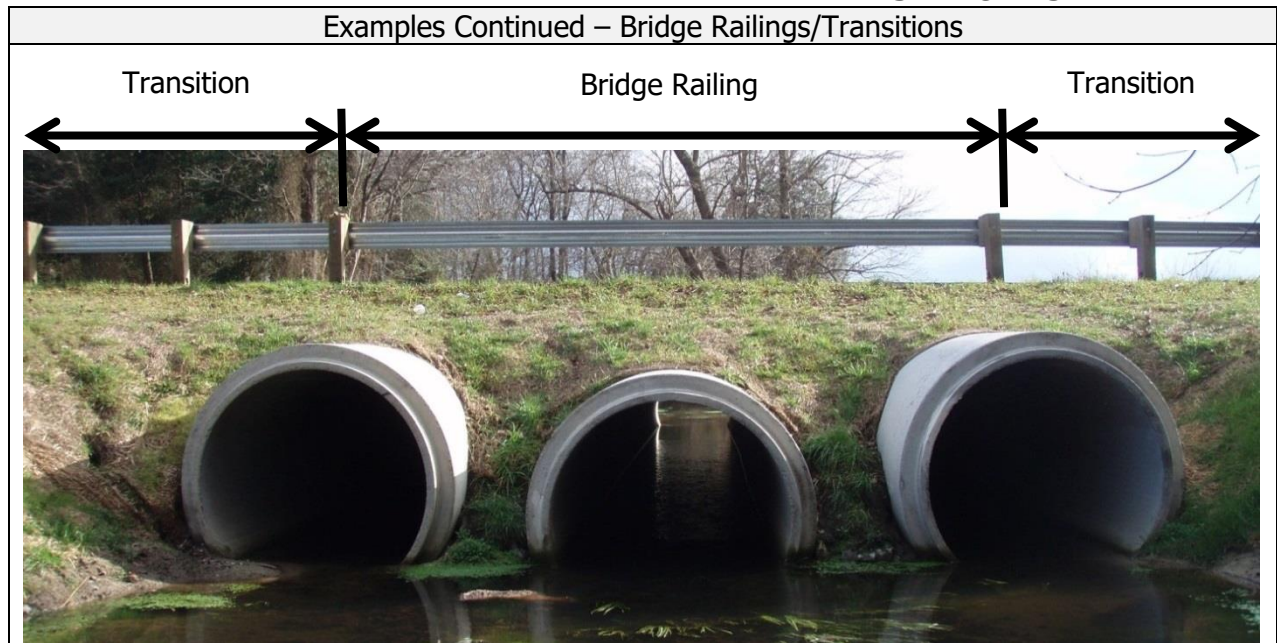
Metal bridge railing and transition for long-span application. (Source: Delaware DOT)
